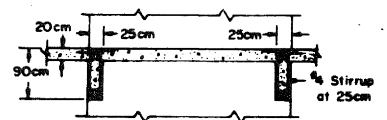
TYPICAL SECTION OF CORE COUPLING GIRDERS
